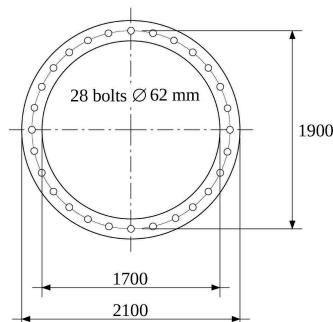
Anchor bolts at +0.350 m (plan view)
